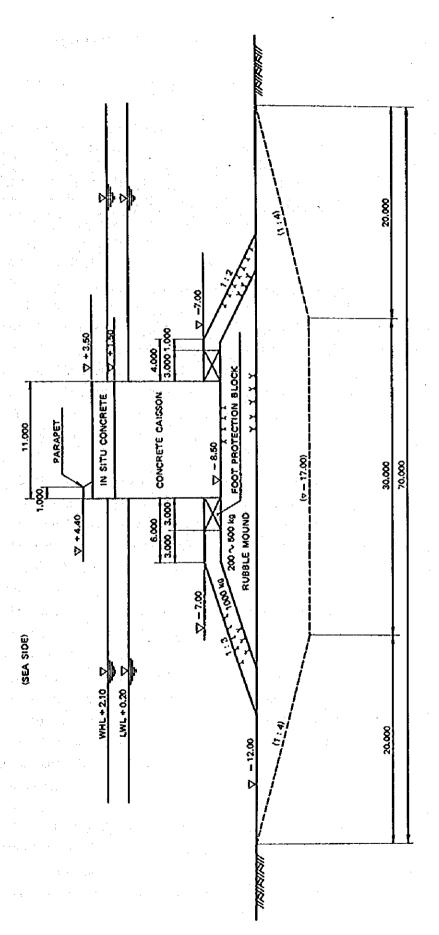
Cross Section of Breakwater (-12 m)
